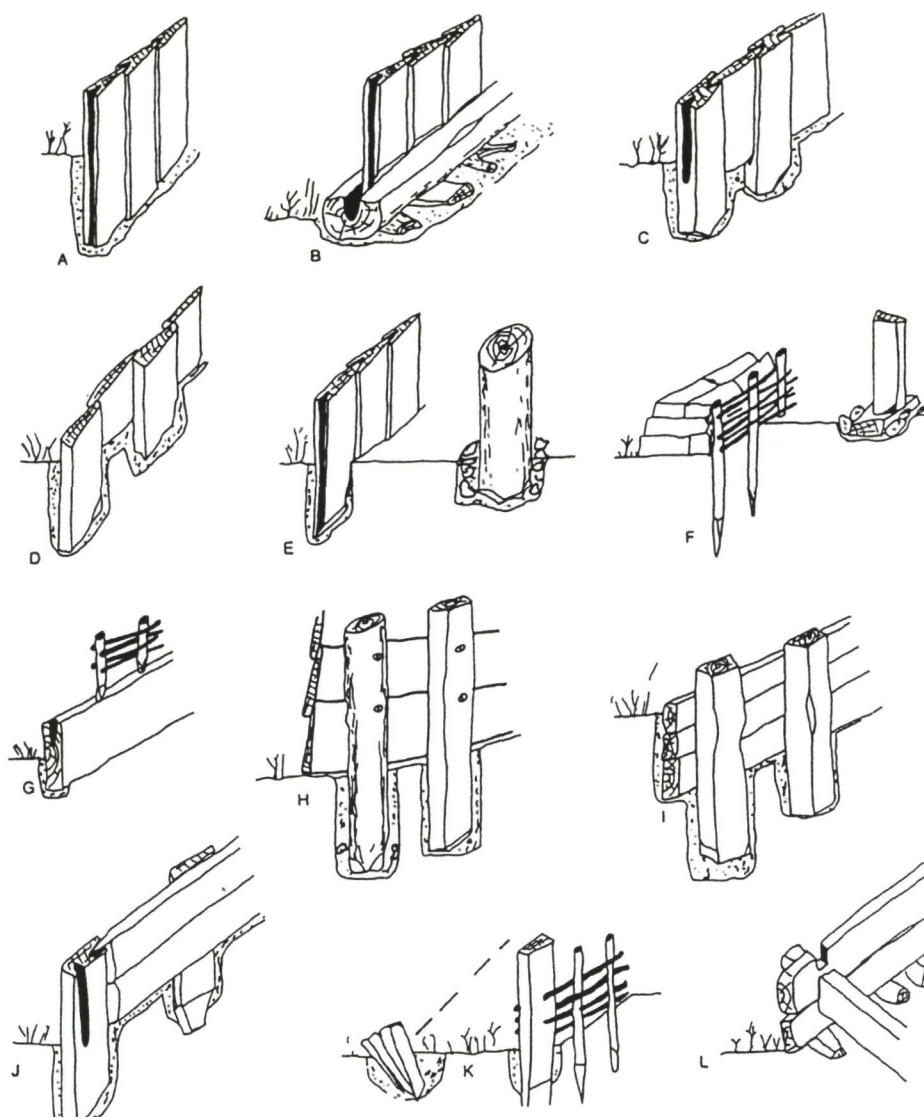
Diagrammatic glossary of most wall and roof support systems known from in situ or reused early medieval building timbers excavated since 1988 in London:
